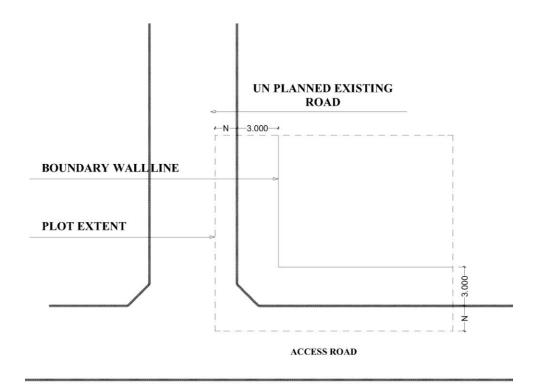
Boundary Wall Setbacks along an Un-Planned Street or Road. Note: Size of road reserve (N) will depend on class and function of the road.
